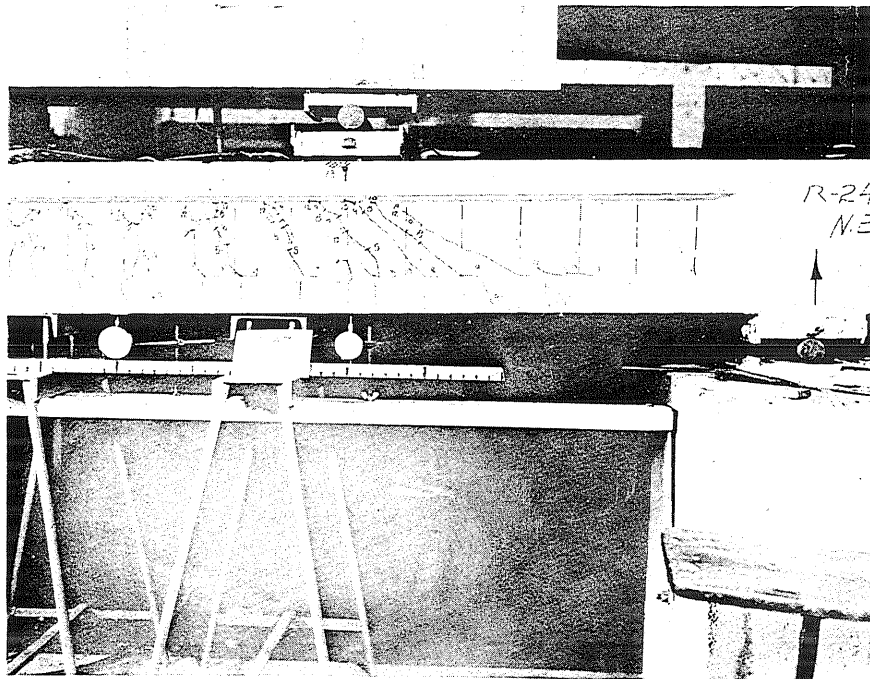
TYPICAL FLEXURE-SHEAR CRACKS
